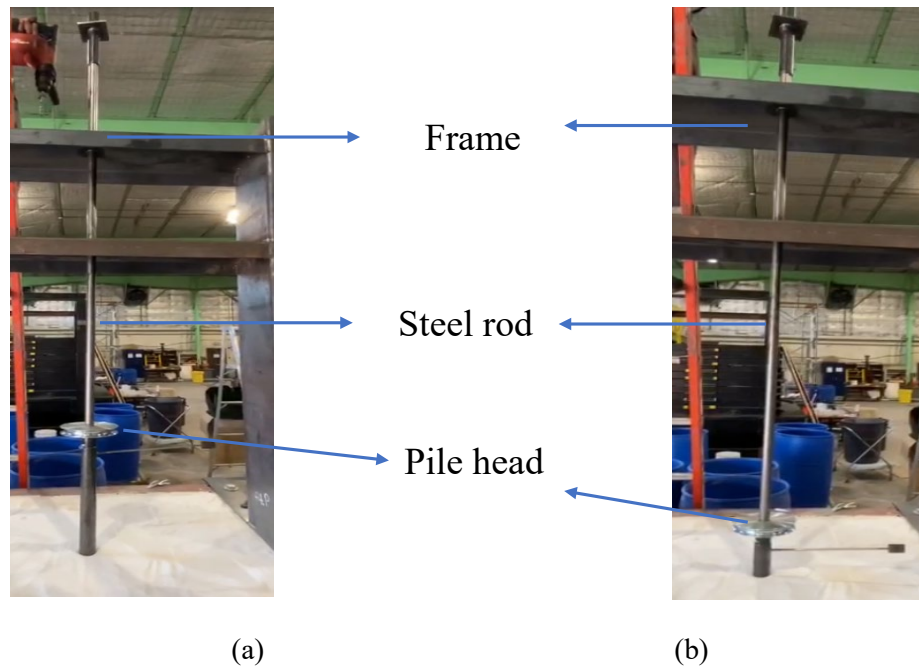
Installation of unfinned piles in the laboratory: (a) before installation; (b) after installation.
